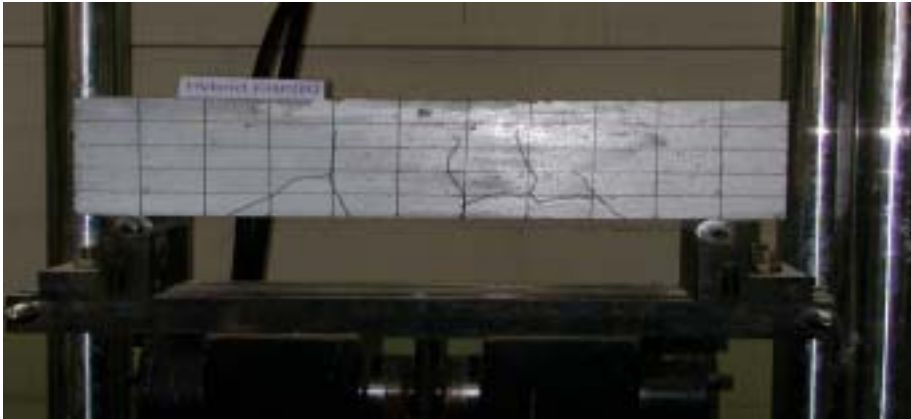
Photo of flexure and shear cracks from hybrid FRP rebar(B) reinforced concrete specimens
